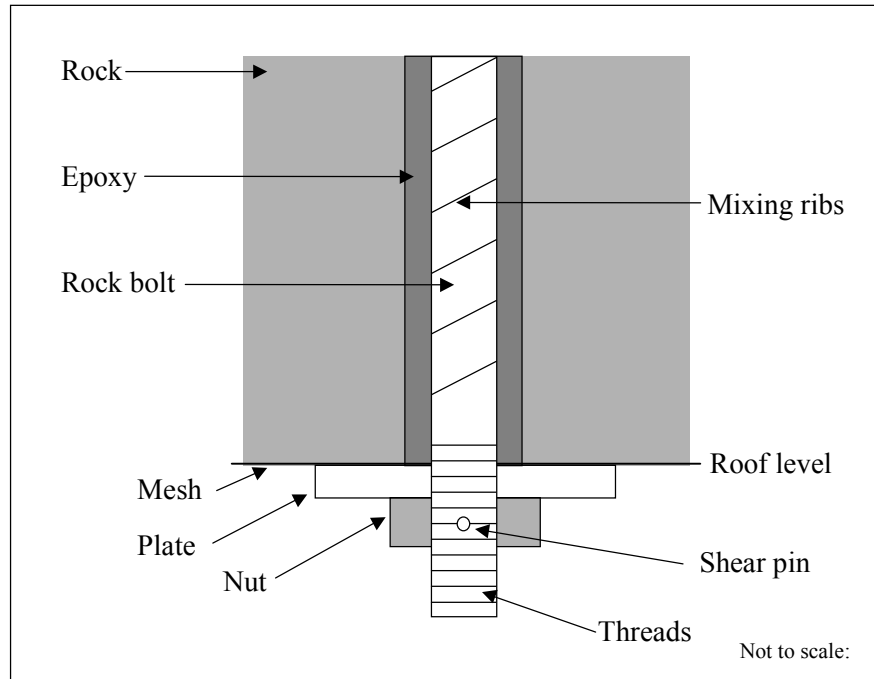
Schematic diagram of a typical rock bolt installation.
